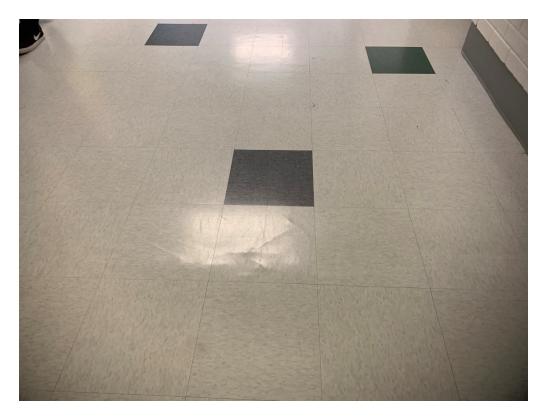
Floor tile at E-216 near E-212 transmitting through pourly prepped subfloor; replace and prep correctly
